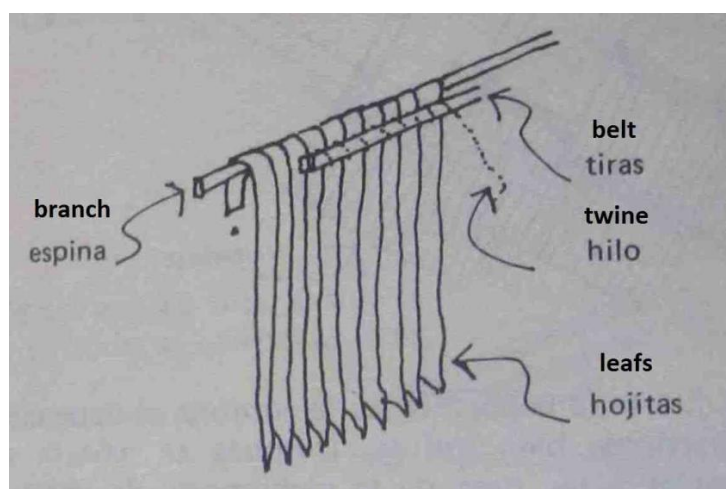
Braiding of roofing with palm leaves. Source: Van Lengen, 2007
